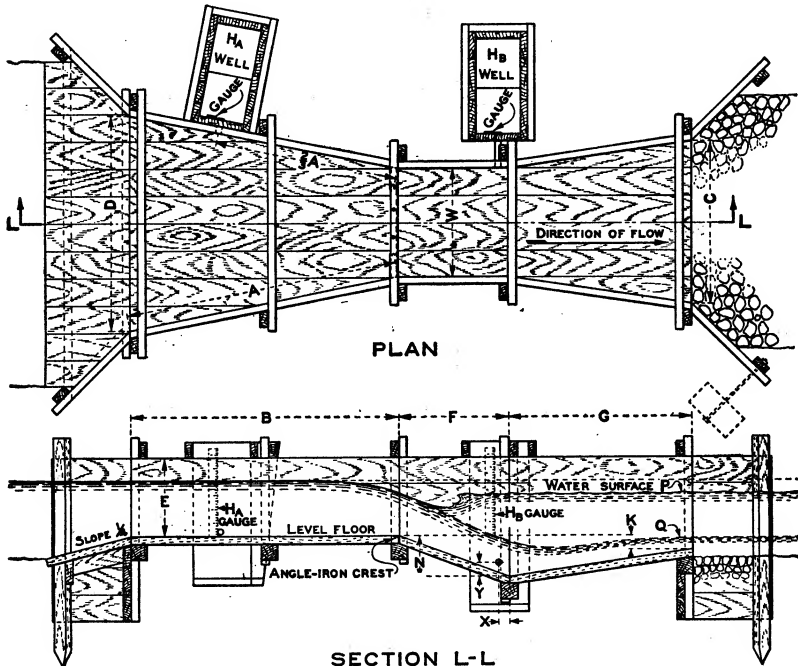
Plan and elevation of the Parshall measuring flume
